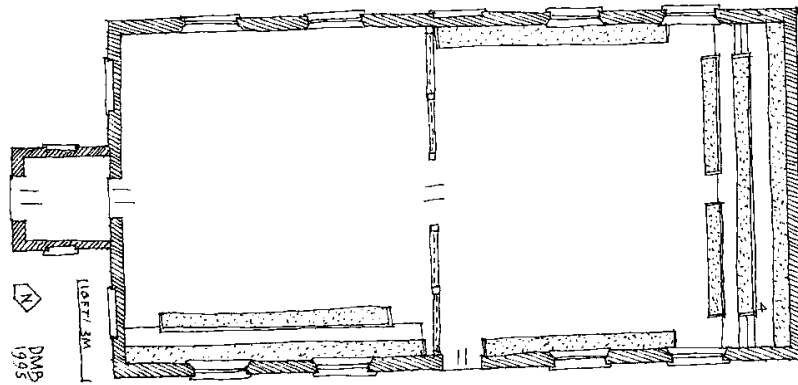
Ground floor plan of the meeting house in c.1850 as reconstructed by Butler (northeast is at the top; not to scale) (Butler (1999), vol. 1, p. 193)
